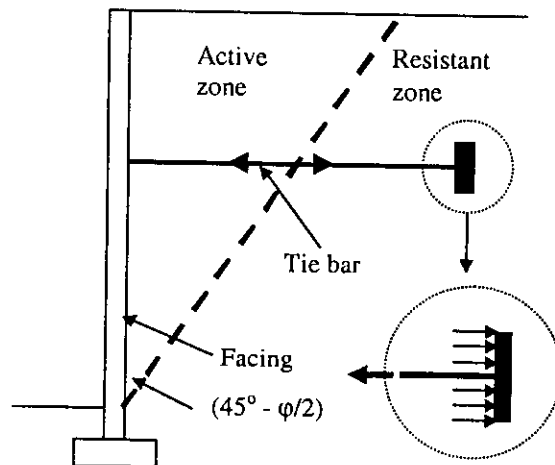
Reinforcing mechanism in anchored earth wall
